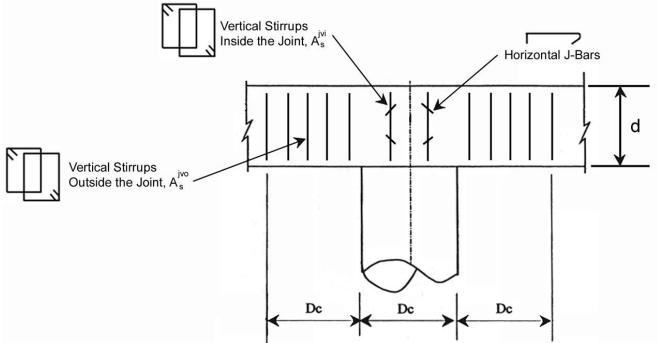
Location of Cast-in-place Vertical Joint Shear Reinforcement
